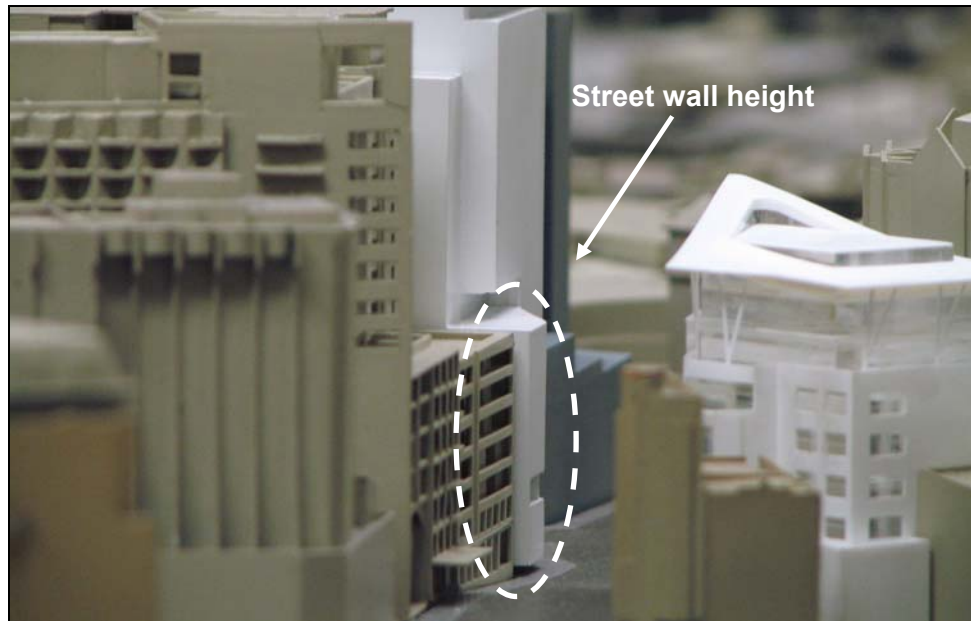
City model showing proposed street wall (Quay Street elevation) height in relation to adjoining development.
